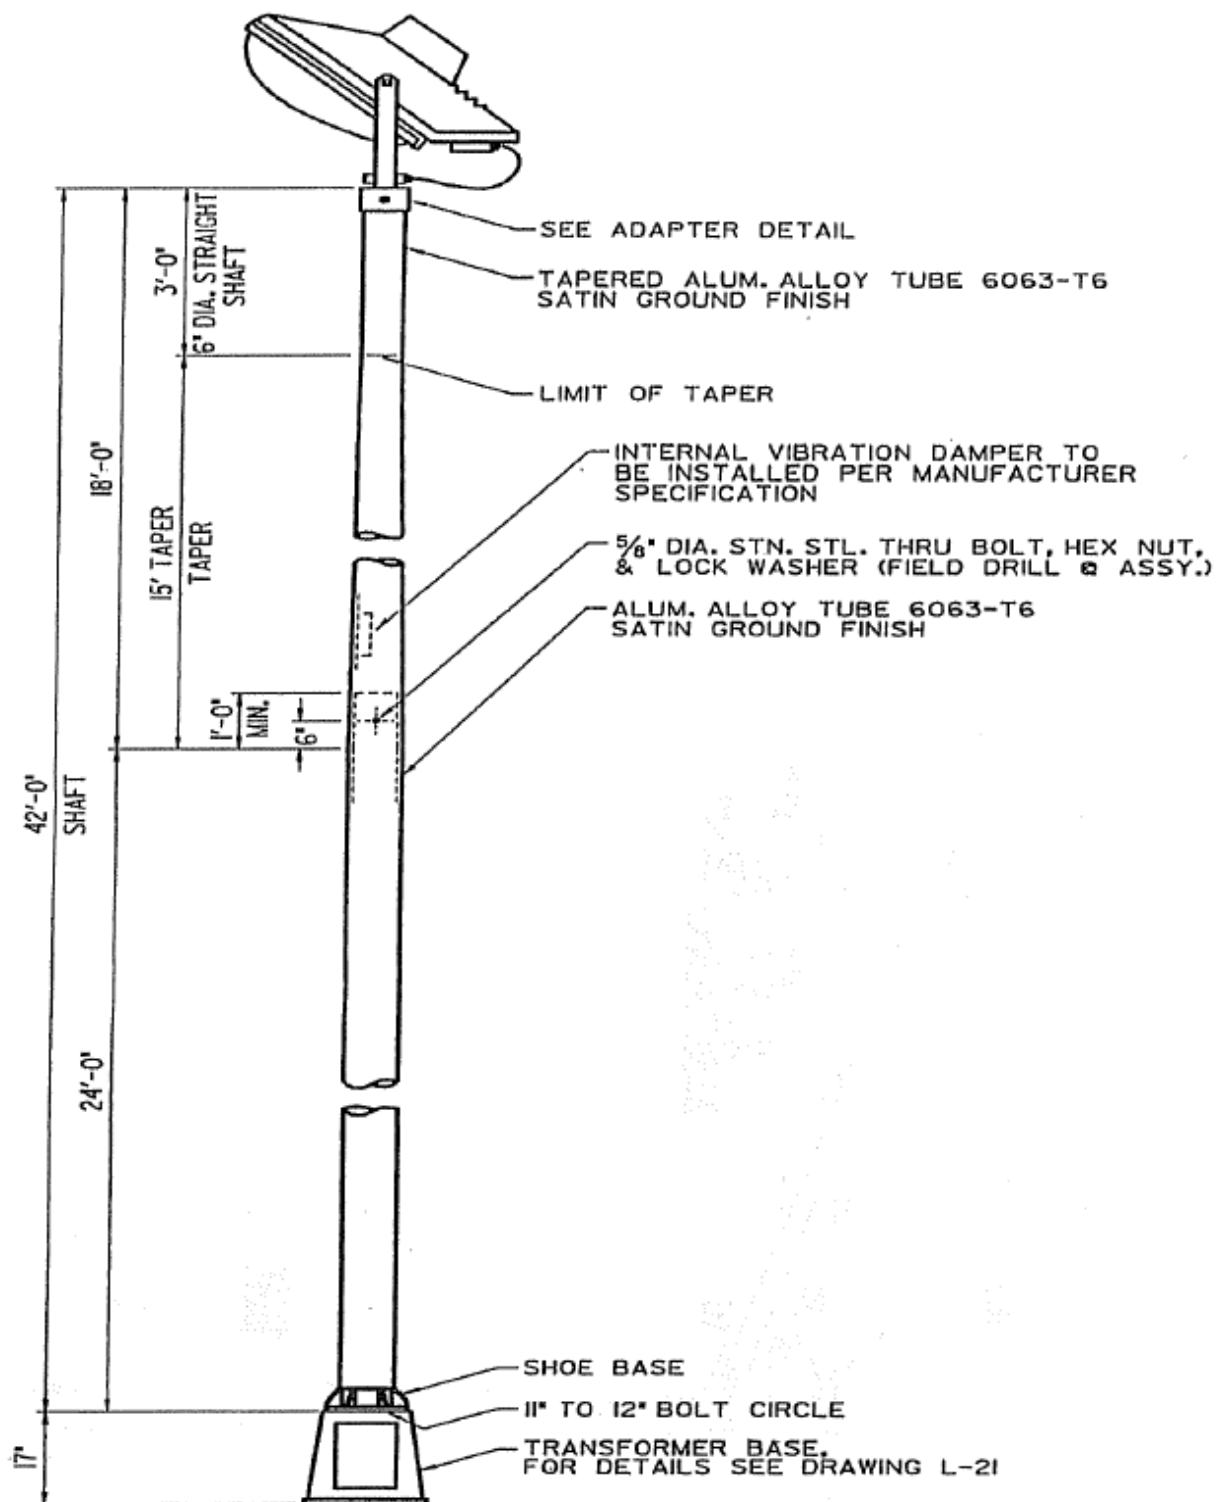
Drawing of straight luminaire support structure (Johns, 1998)
